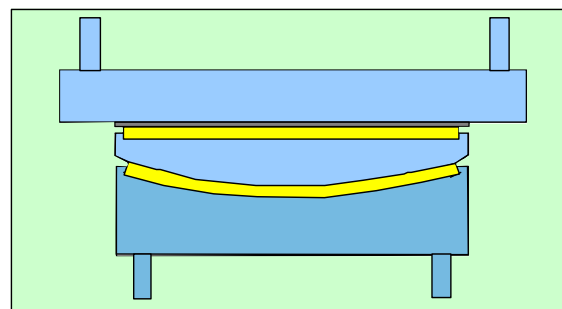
Cross section of spherical bearing free-sliding type KGA
